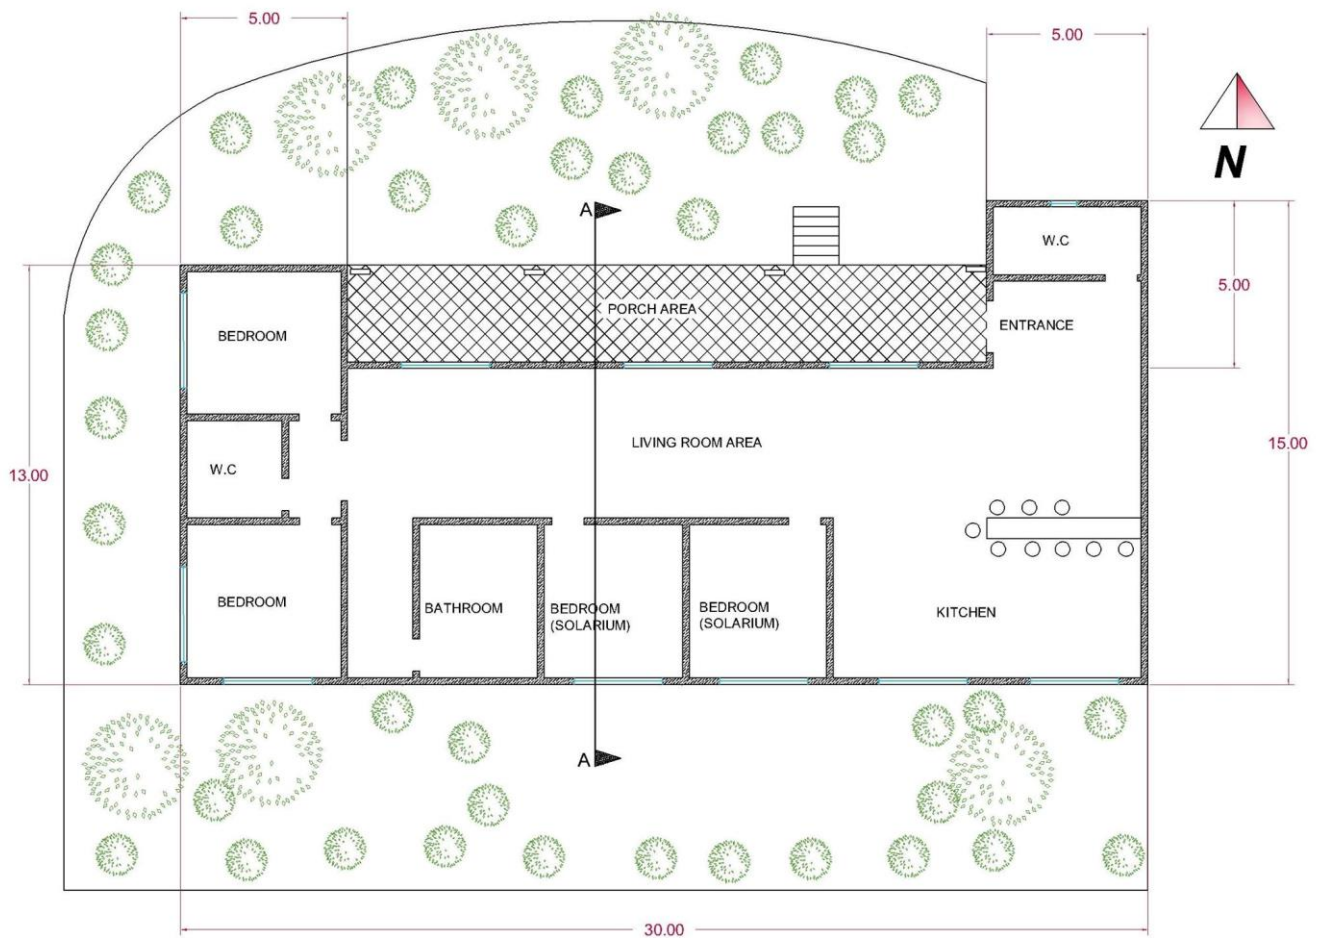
14 Ground Floor plan of House 2 (Movahedi, 2014)
